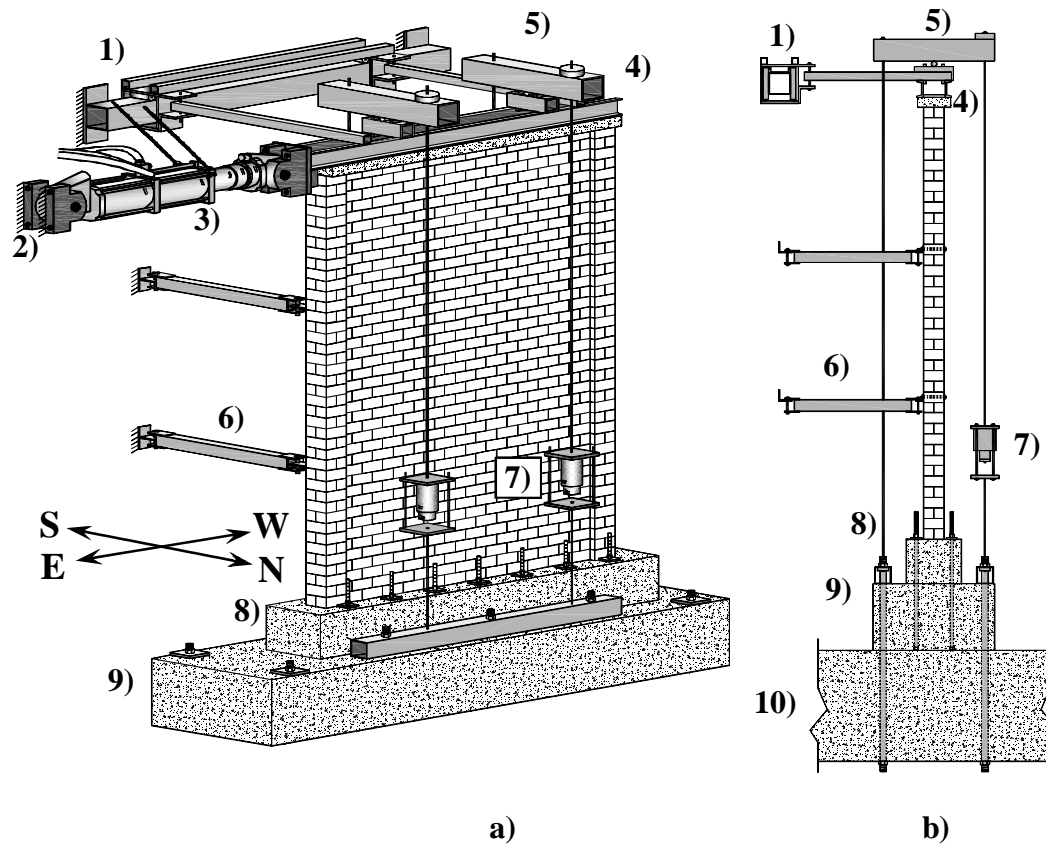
Test Set-Up with Wall 11: a) Isometric View and b) Elevation View:
